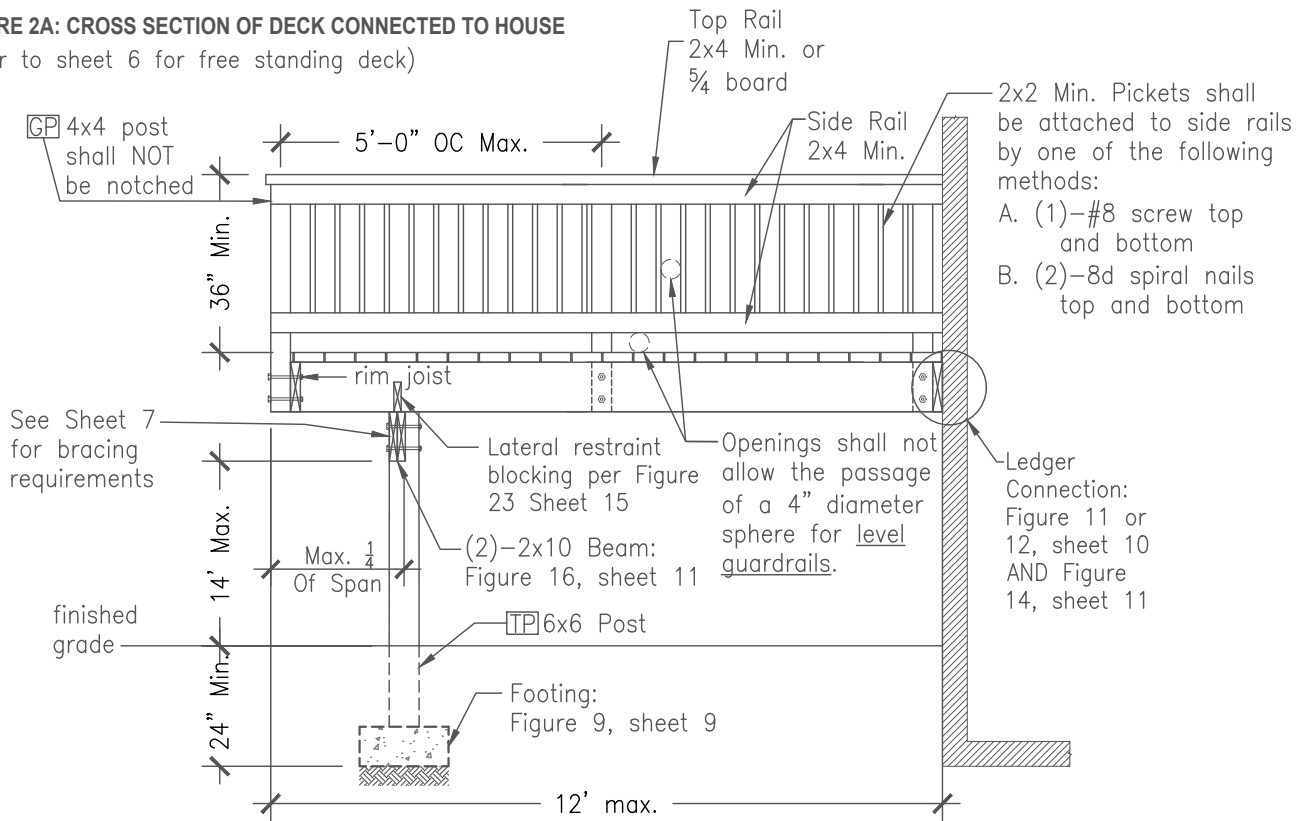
B: CROSS SECTION OF DECK CONNECTED TO HOUSE
